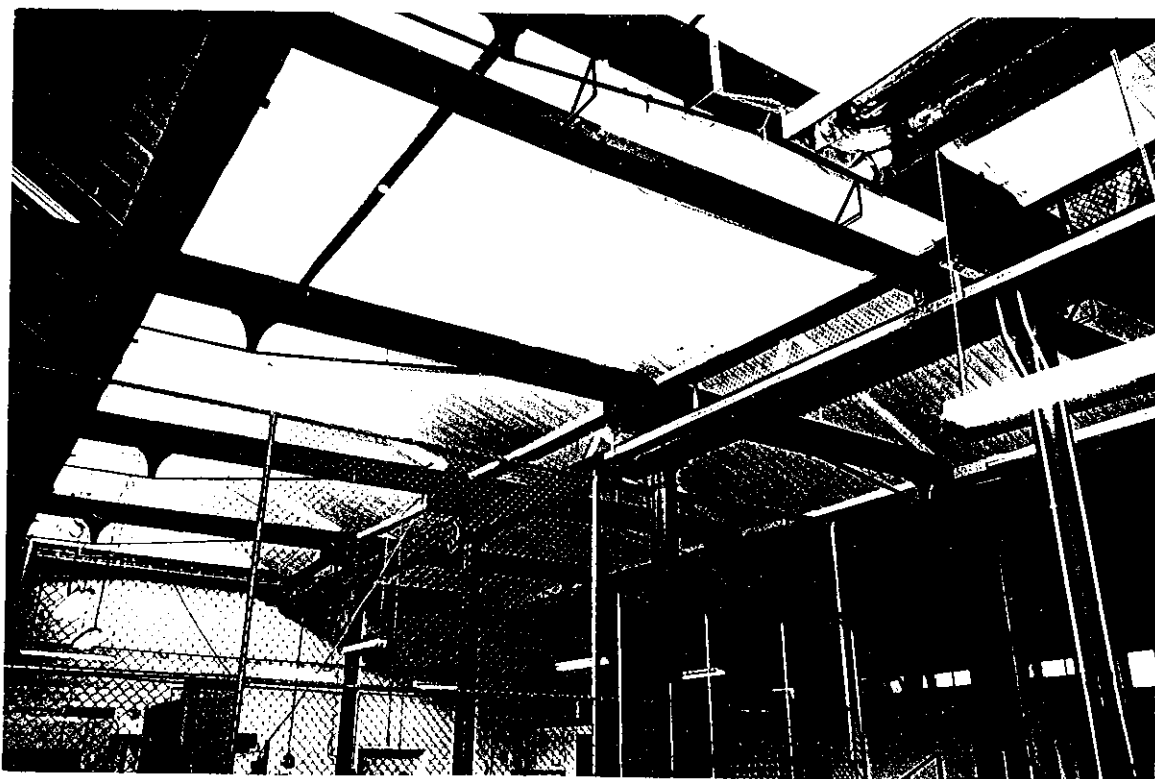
Saw-tooth roof of main workshop area, showing trussed timber and iron beams and iron columns (Building 28).
